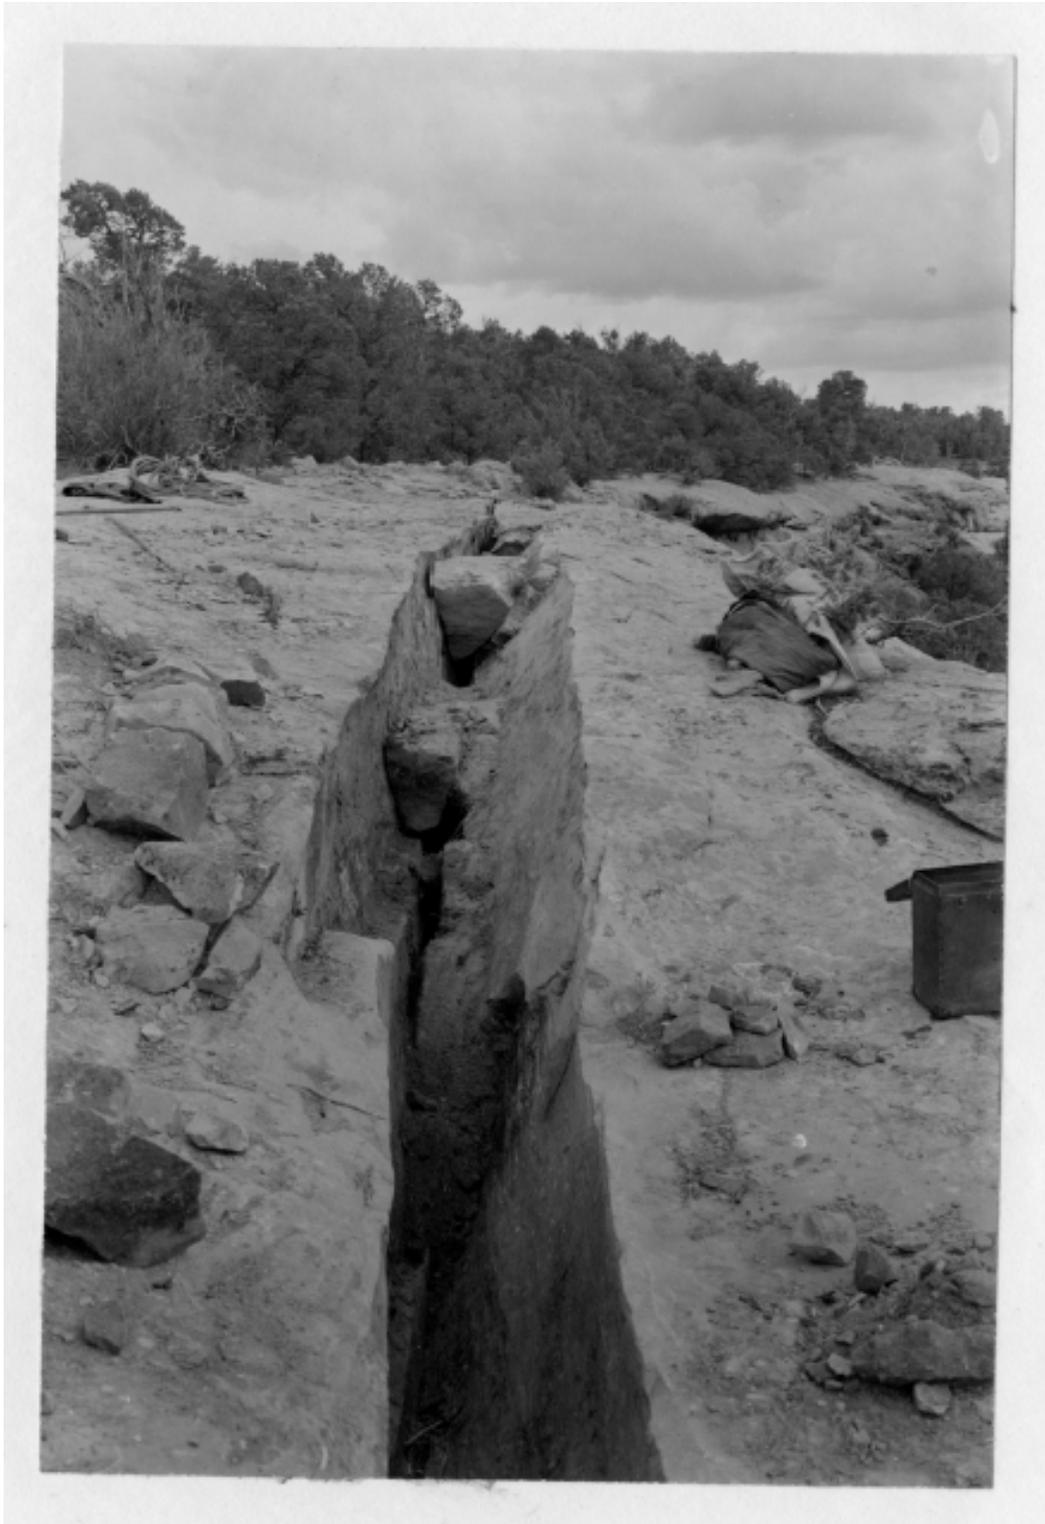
View of widest portion of crack. Looking south. Near Sta. 2+00 +/-.
